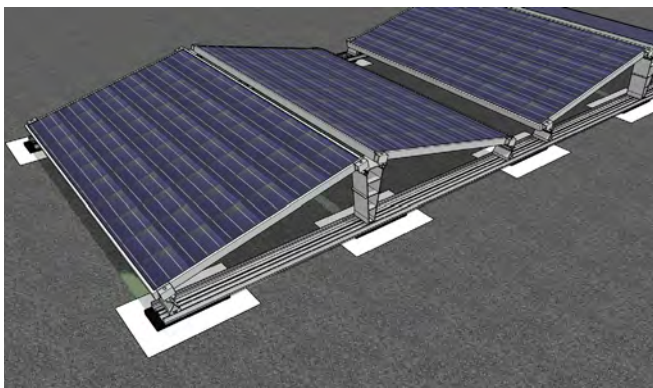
Slip sheets provide an additional layer of roof surface protection for an adhered roof
